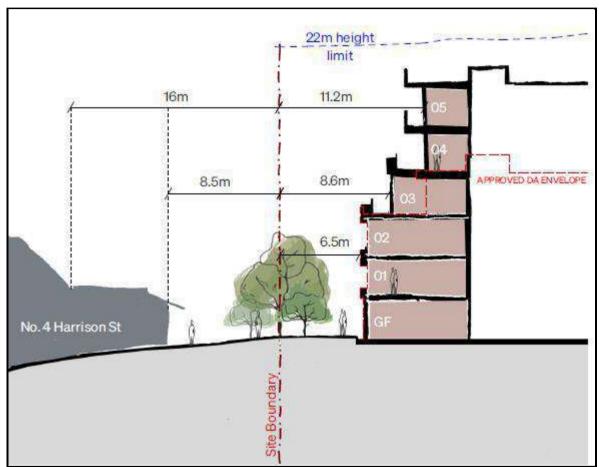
Section showing separation between the proposed buildings and the properties to the south.
